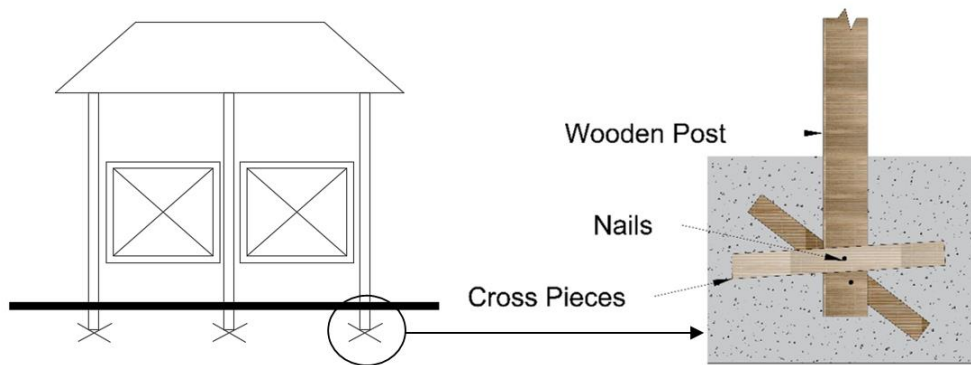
ANCHORING OF WOODEN POST USING CROSS PIECES
